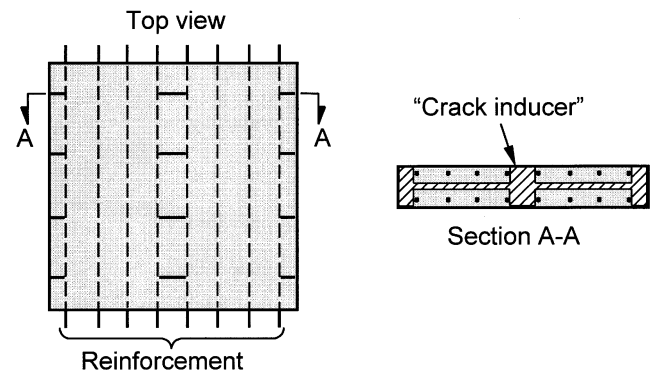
Example of test member for anchors in tension in cracked concrete.
